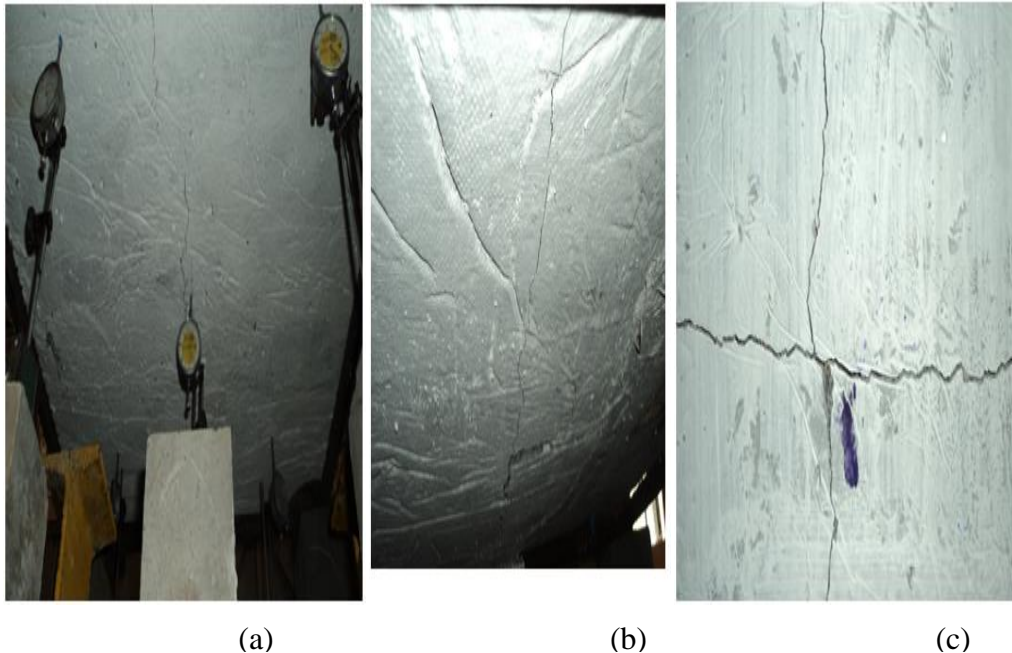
First crack of bamboo reinforced slab (a) Triangular bamboo cross section (b) square bamboo cross section (c) circular bamboo cross section
